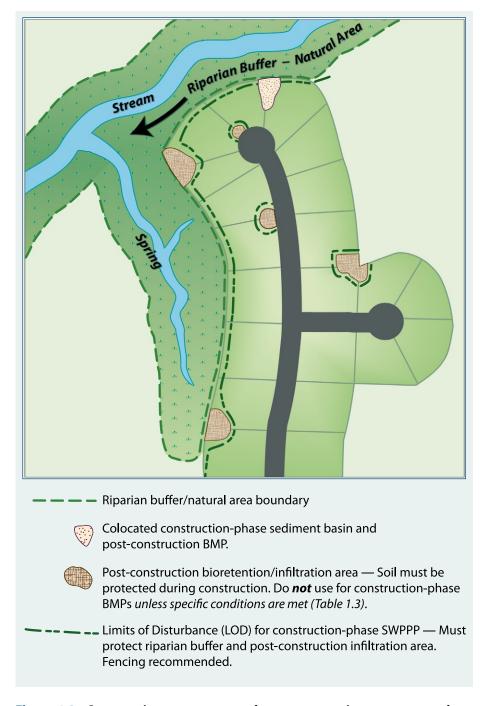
Construction stormwater and post-construction stormwater plans must be coordinated to protect post-construction design features and BMPs
